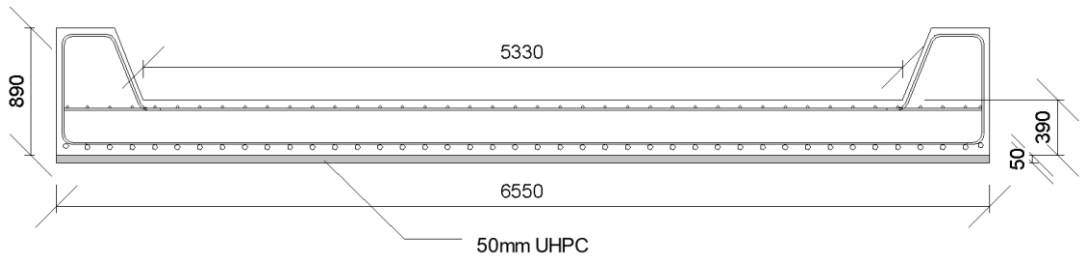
Bridge cross section where a 50 mm UHPC overlay is applied at the underside of the bridge deck
